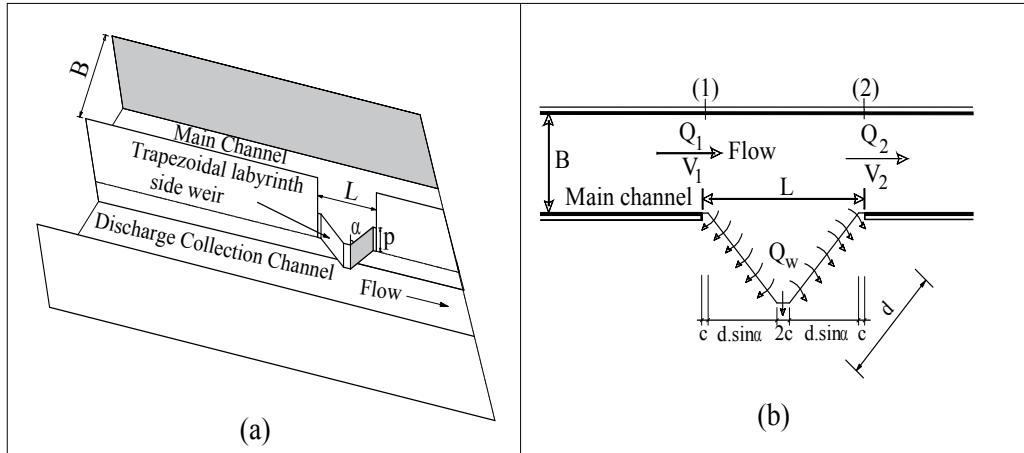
Trapezoidal labyrinth side weir: (a) Schematic view, (b) Plan view
